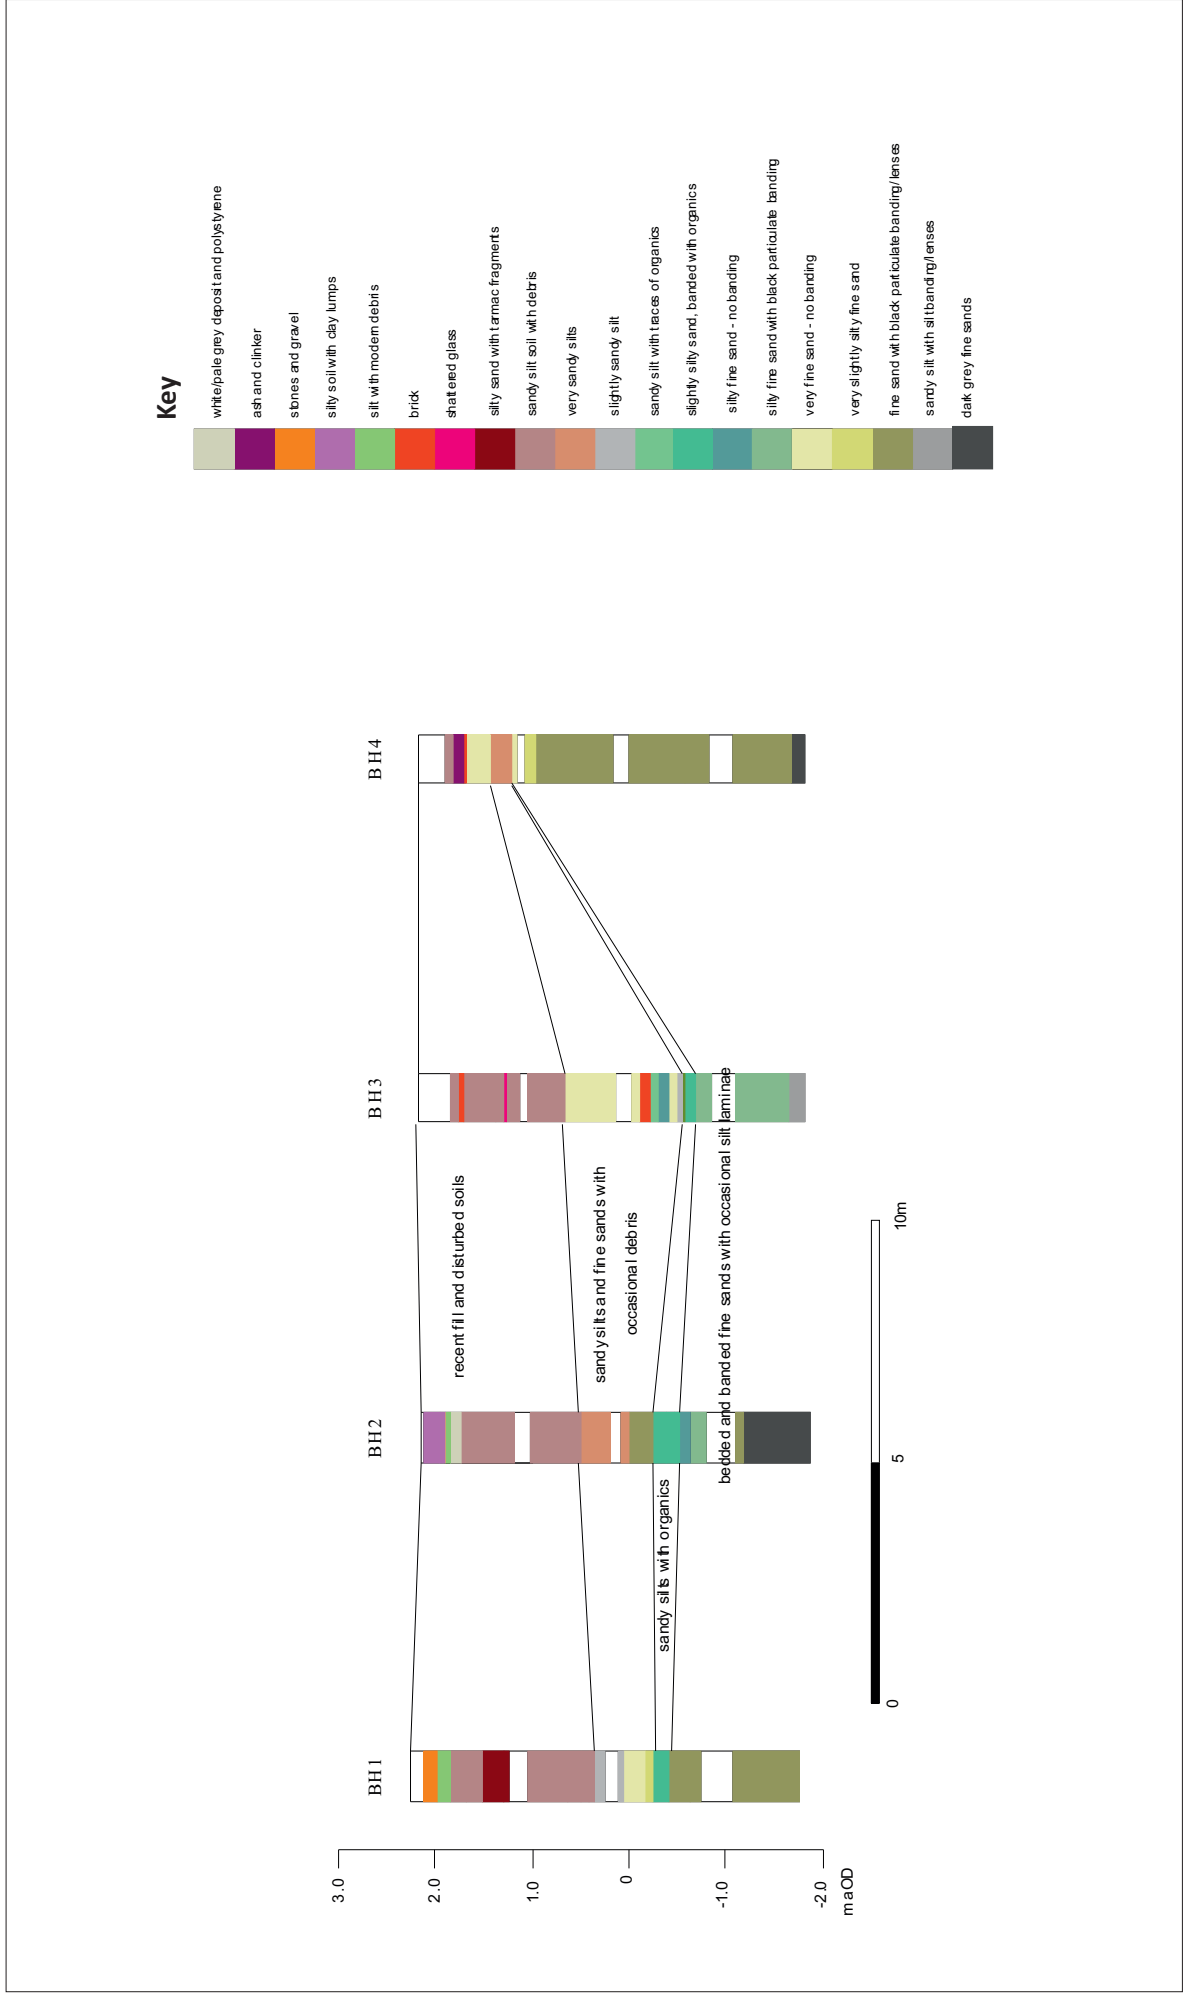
North-west to south-east section across the north-east end of the site reconstructed from the logged borehole data
